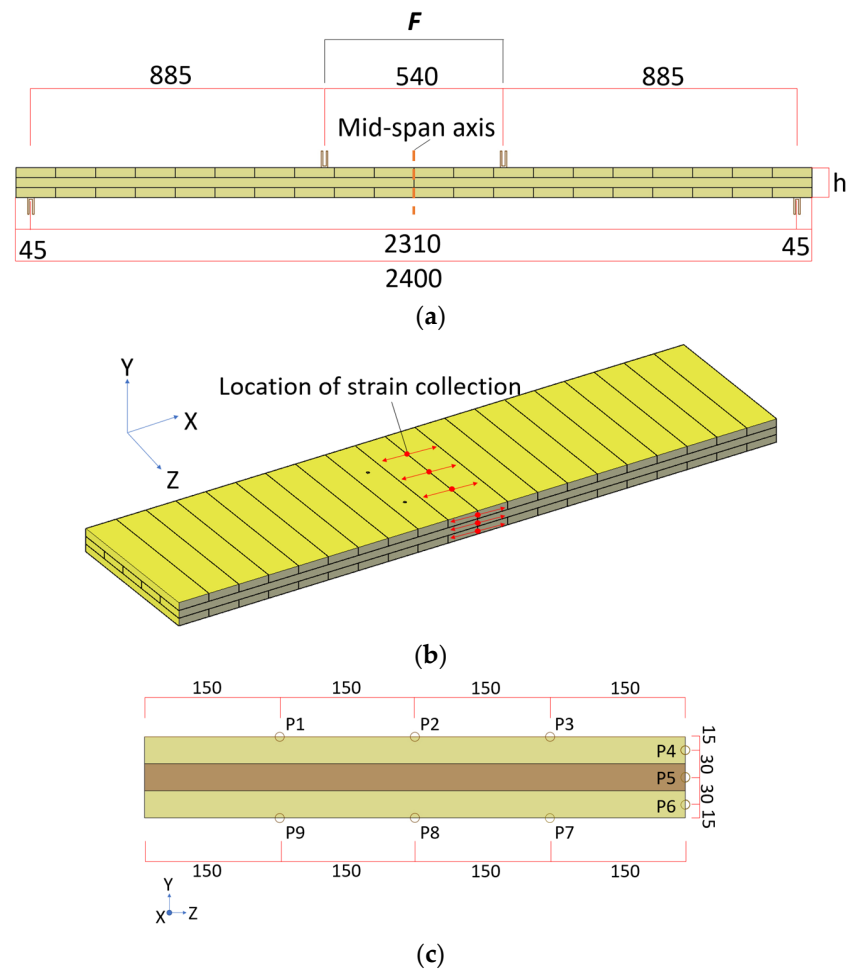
Four-point bending test setup: (a) connected panels with boundary conditions, (b) location of strain's collection points, and (c) section view at panel's mid-span (dimensions are in mm).
